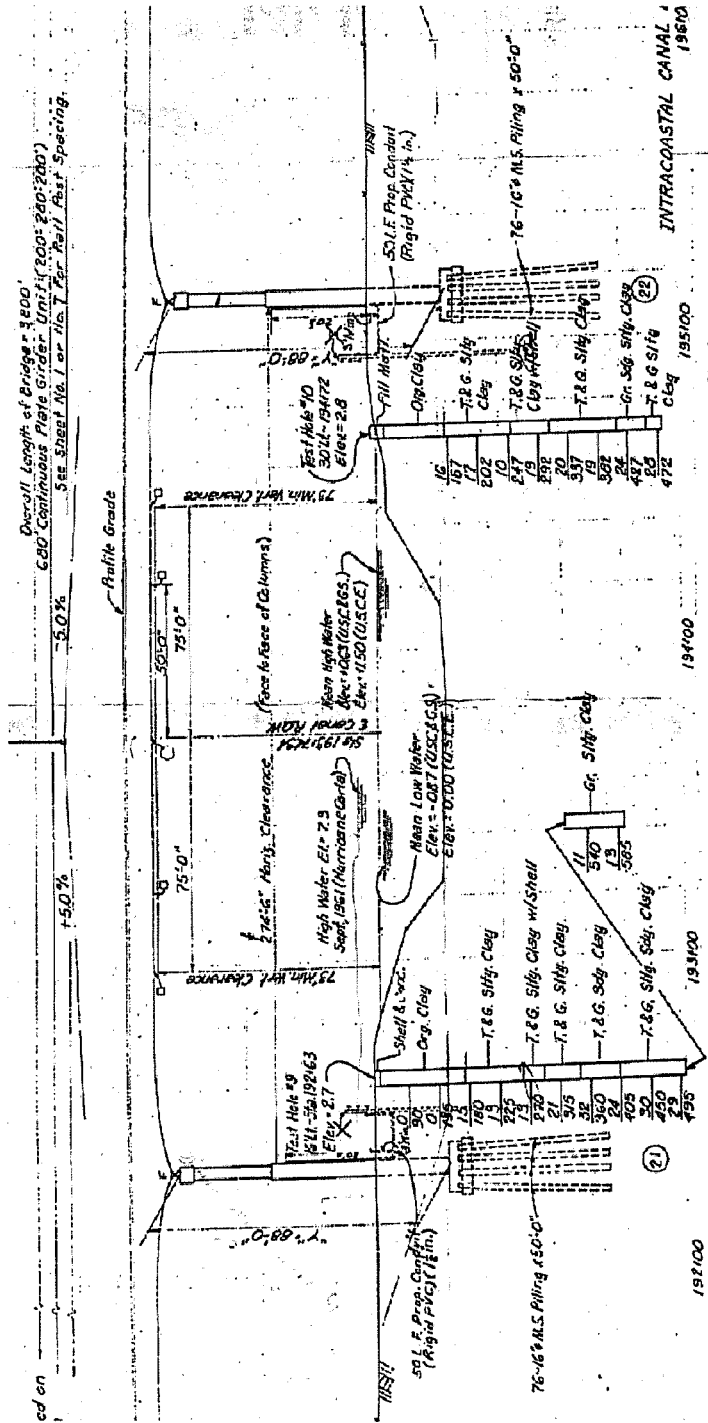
SH87 Bridge over the GIWW Elevation (TXDOT Construction Documents, 1969)
